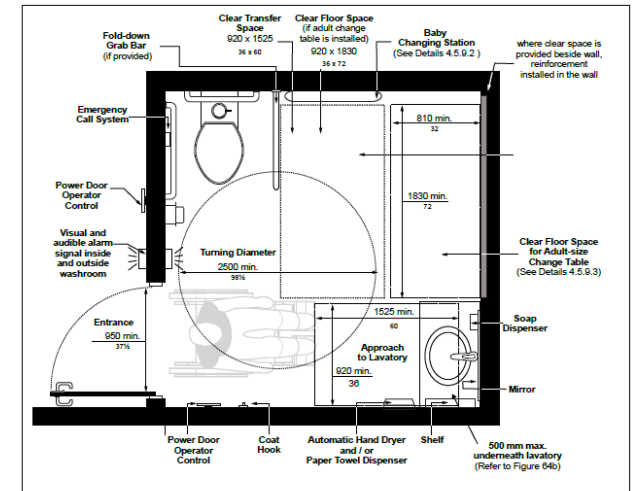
Example of Universal Washroom Layout and Typical Amenities (Conceptual - Layouts Can Vary)
